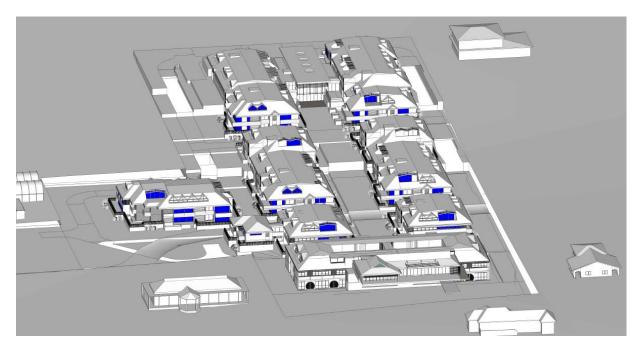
Concept plans looking south-west across the site, with the residential aged care facility in the foreground along Vineys Road.
